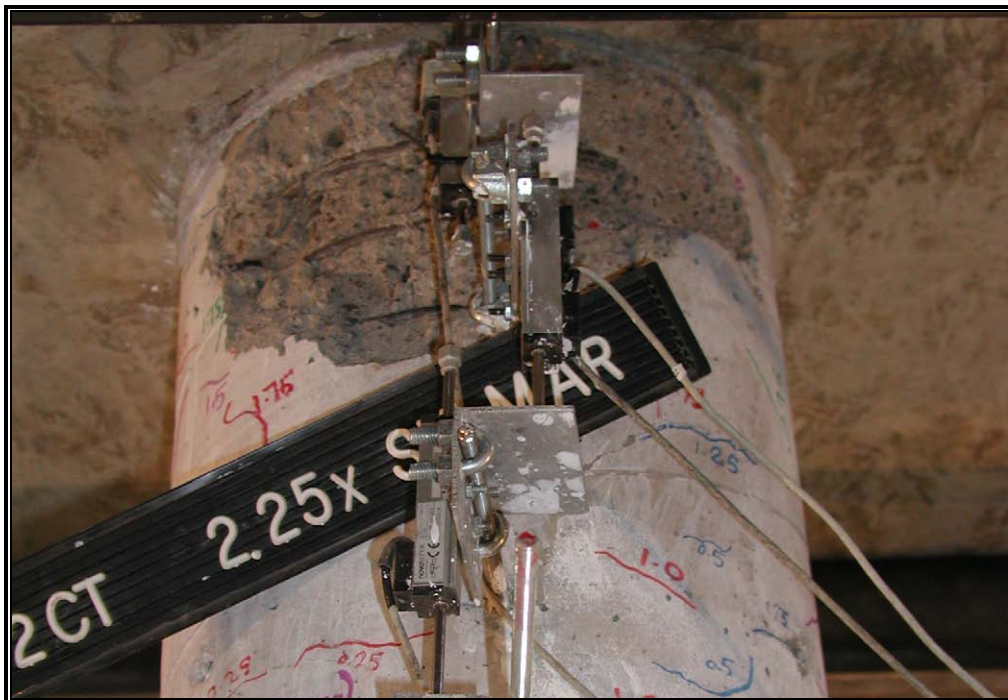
Concrete Spalling on East Side of West Column
